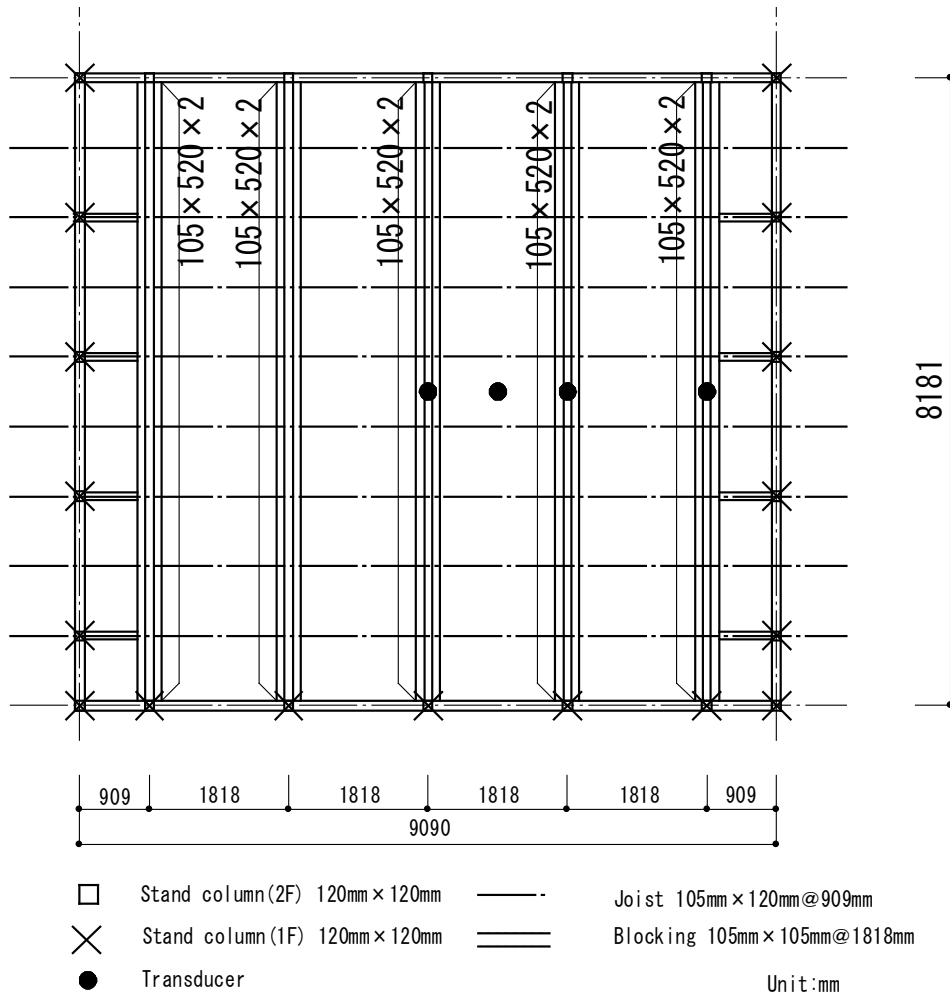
Upstairs floor framing plan of a measured room in elementary school D.
